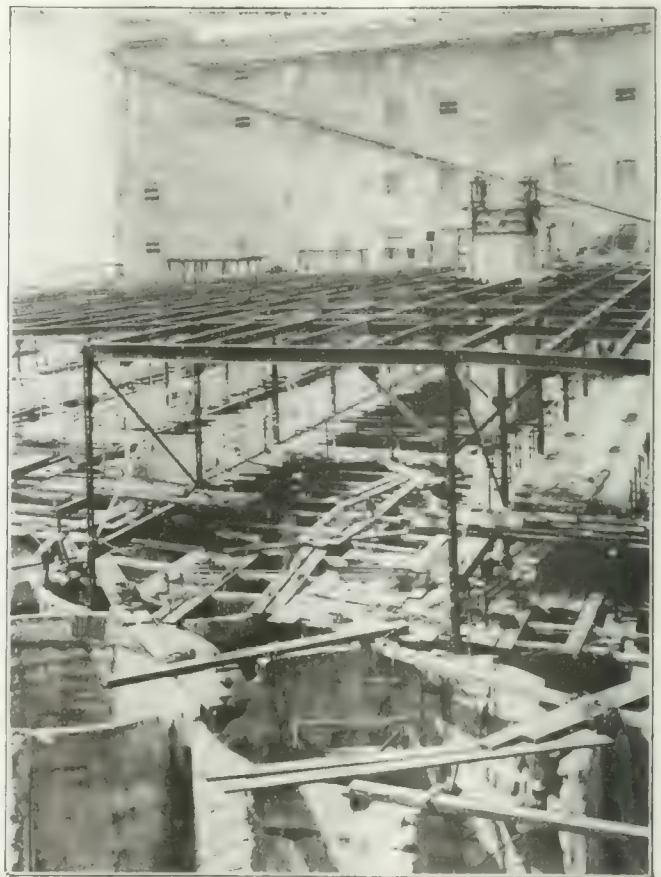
REPAIR AND REBUILDING OF ELEVATOR
